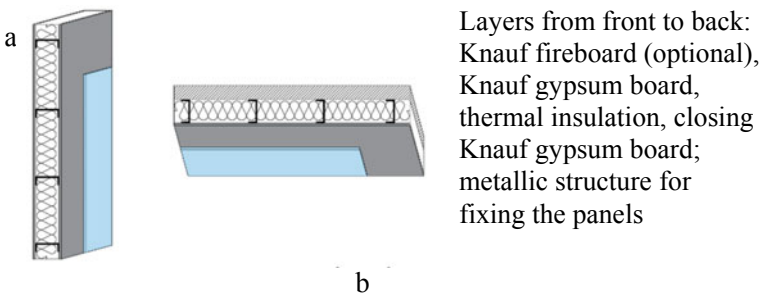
Knauf a interior walls and b ceiling systems (adapted from [28])
